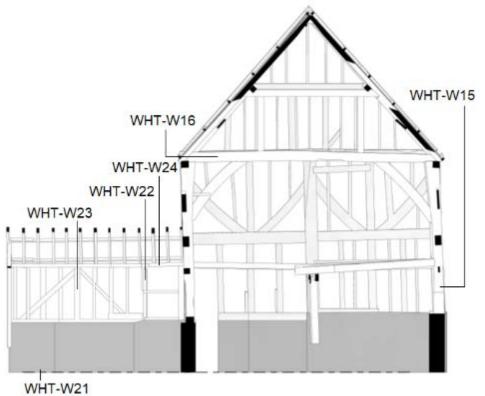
Section through Truss 6, east face, showing the sampled timbers, WHT-W15-16, and WHT-W22-24 (after ATD London Ltd)
